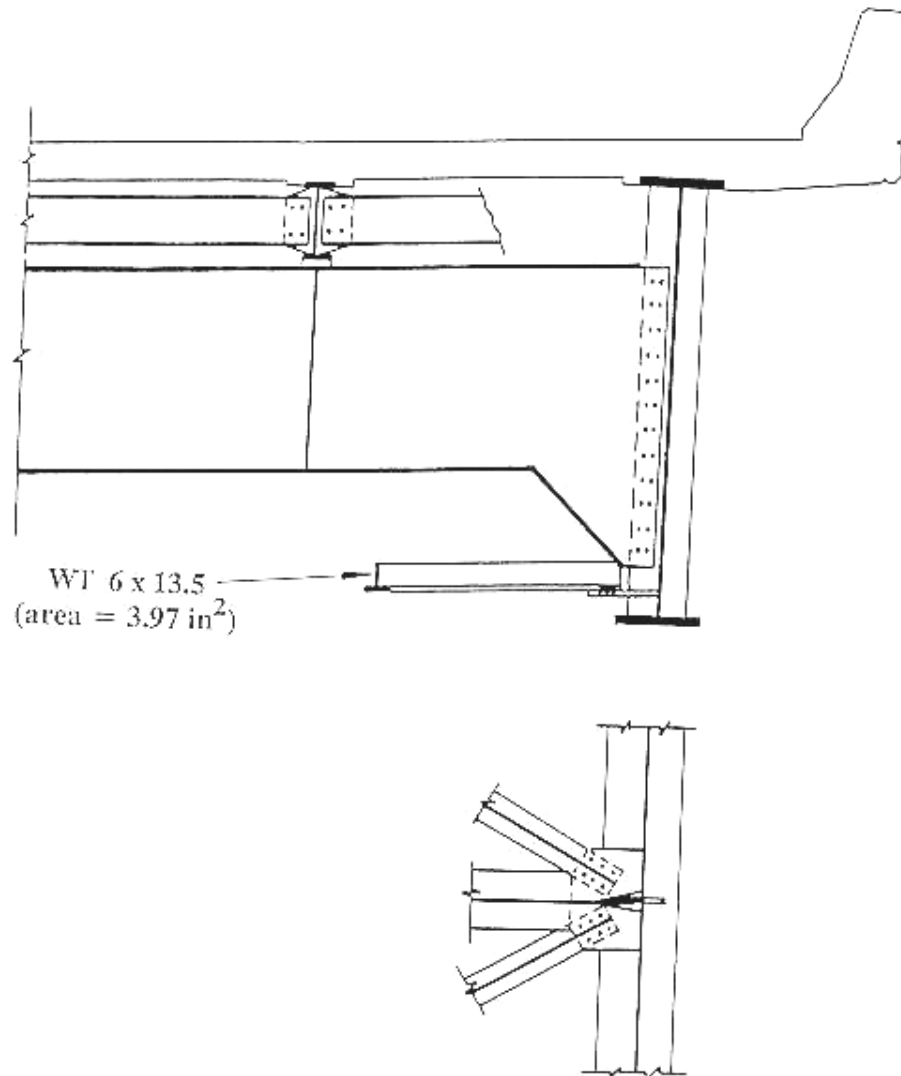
Floorbeam and lateral cross bracing connections in the Big Sandy Creek Bridge (Demers and Fisher, 1990)
